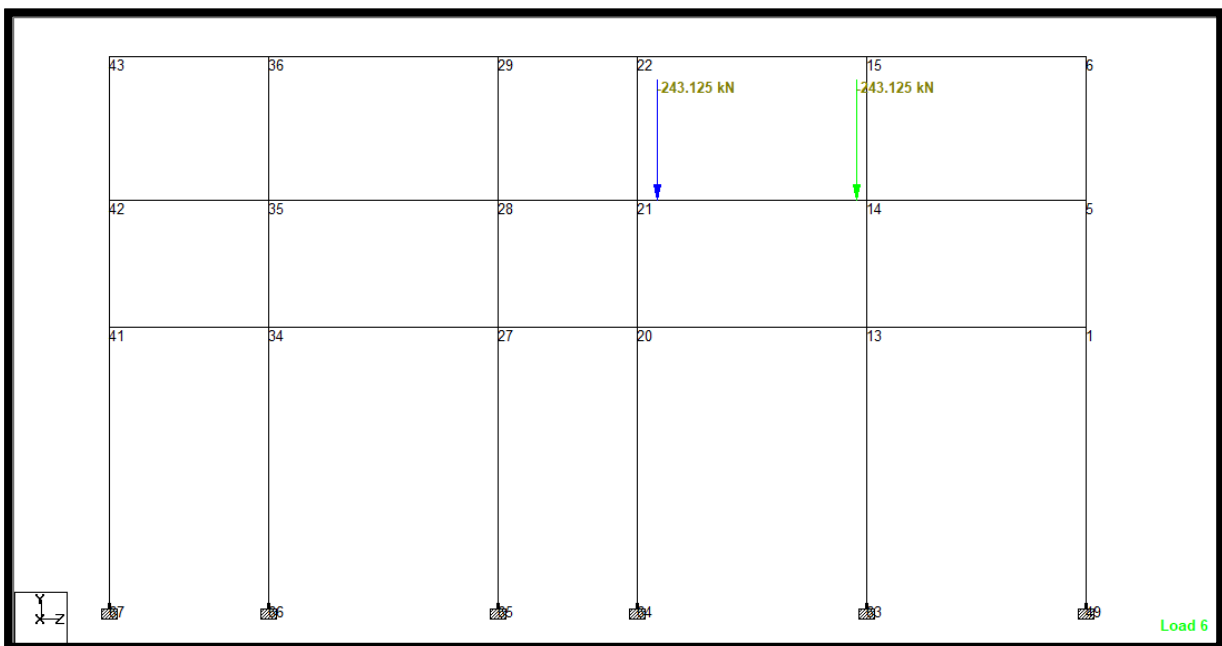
12 Crane wheel load on beam (Crane load-3)
